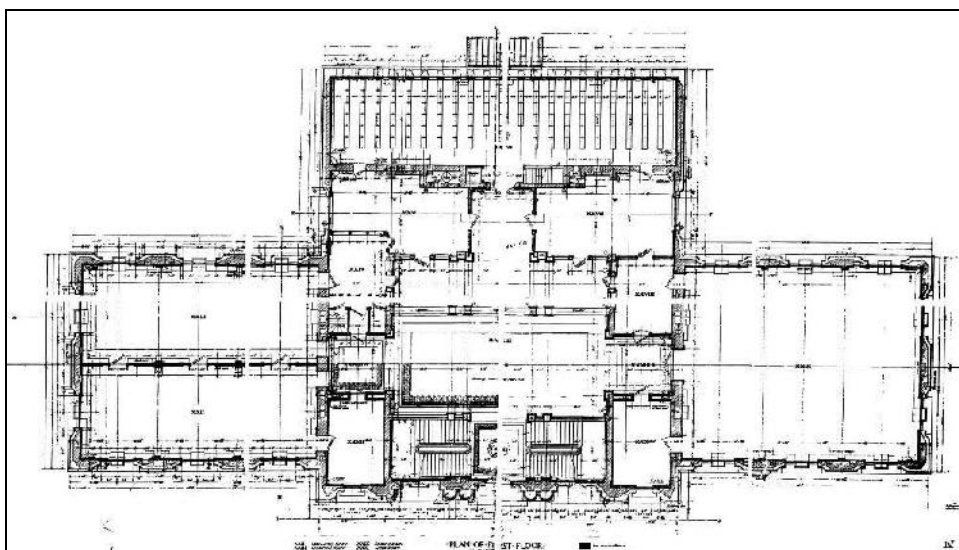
First Floor Plan, 1900. Ackerman & Ross. D.C. General Services Administration.
